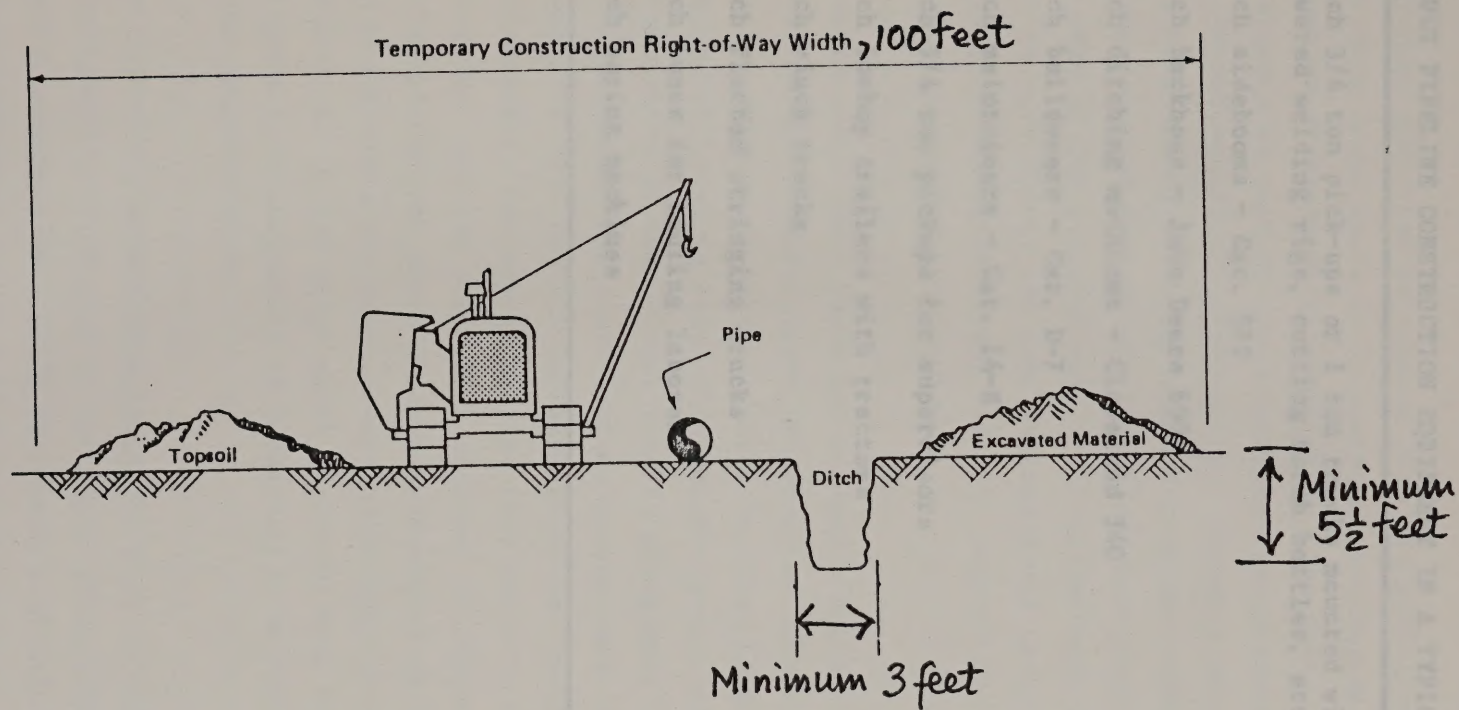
TYPICAL CONSTRUCTION RIGHT-OF-WAY CROSS SECTION
